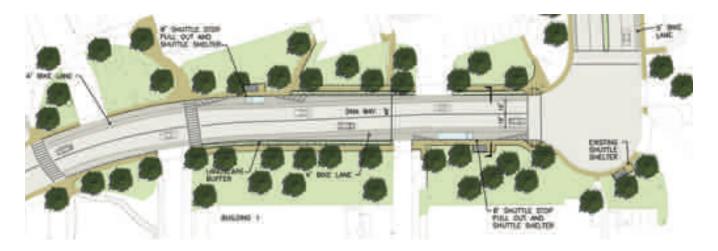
Shuttle Stop and Streets are Concept at DNA Way
